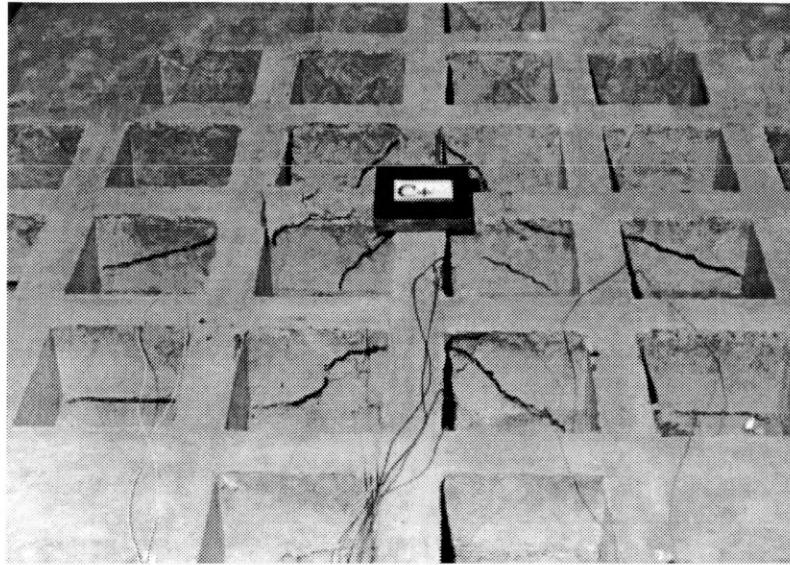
(d) Crack pattern after punching failure — slab No. 4
